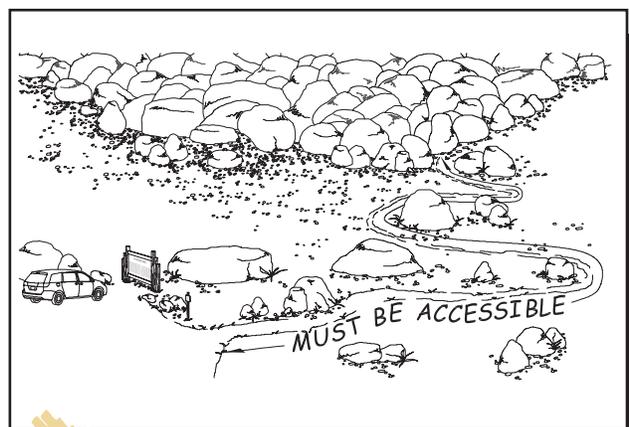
This trail section is over 500 feet (152 meters) long and must be accessible.
